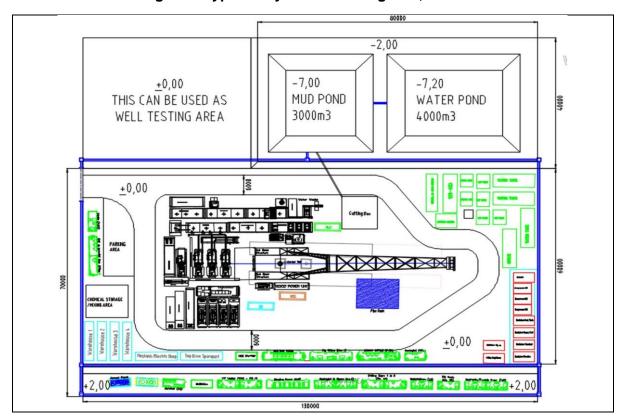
Typical Layout PRA of Rig - 09, 1500 HP
